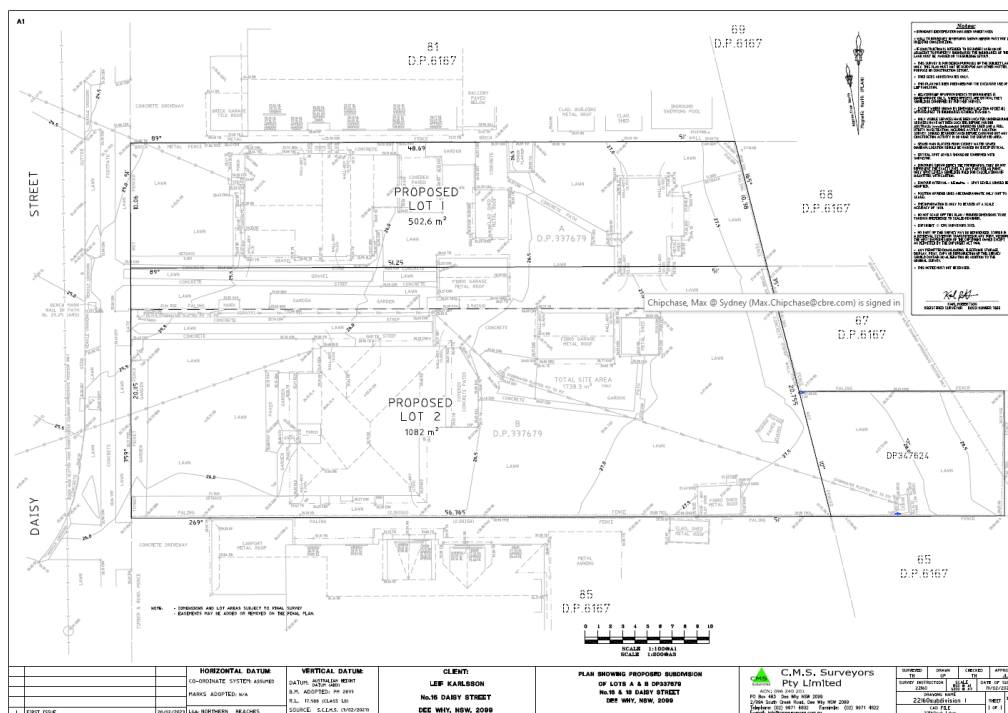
The proposed plan of subdivision which provides the realised boundary adjustment.
